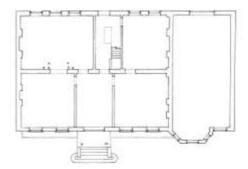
Ground floor plan of Grove End House in 1820 (Note that this is based on informed assumption rather than an actual record of the plan in 1820)
